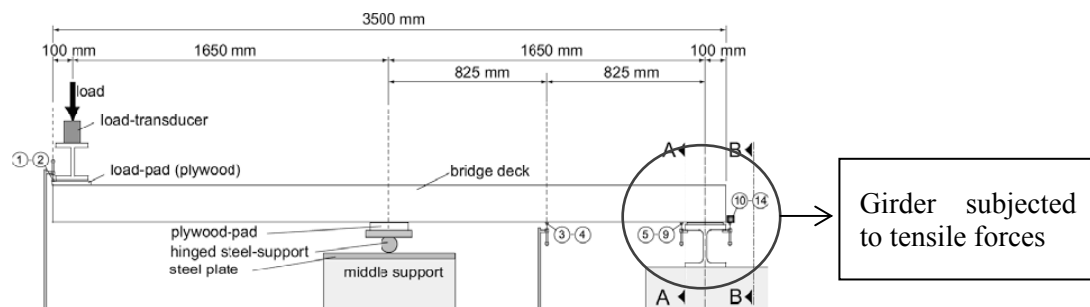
Test set-up of the hybrid girder subjected to tensile forces (Keller & Schollmayer, 2009)
